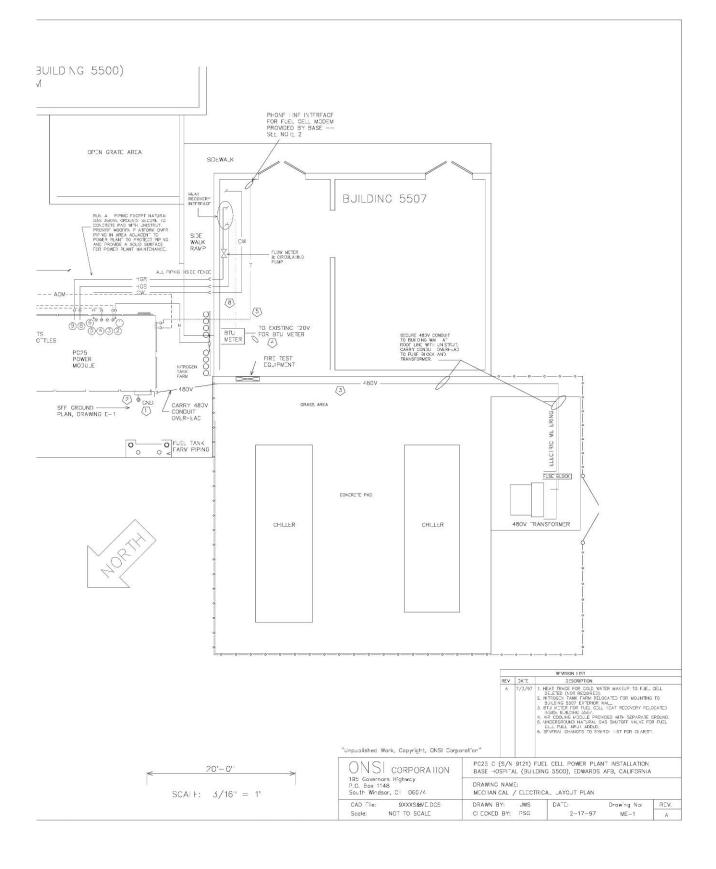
Final installation drawings – mechanical / electrical layout plan.
